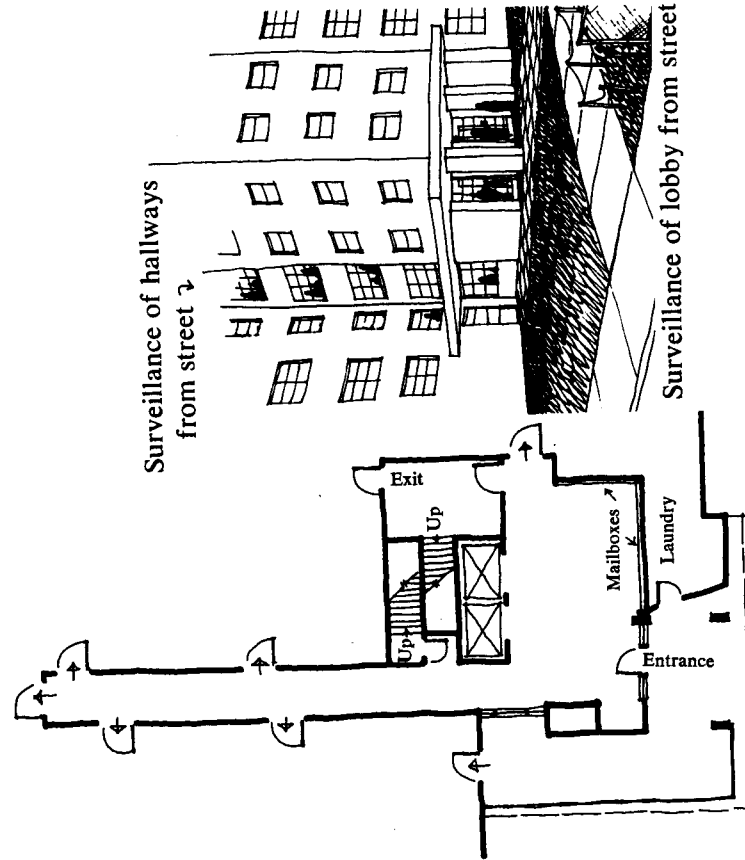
Plan of Typical Floor, Double-Loaded Corridor Apartment Building. Scissors stairs positioned behind a bank of elevators in a double-loaded corridor building.
